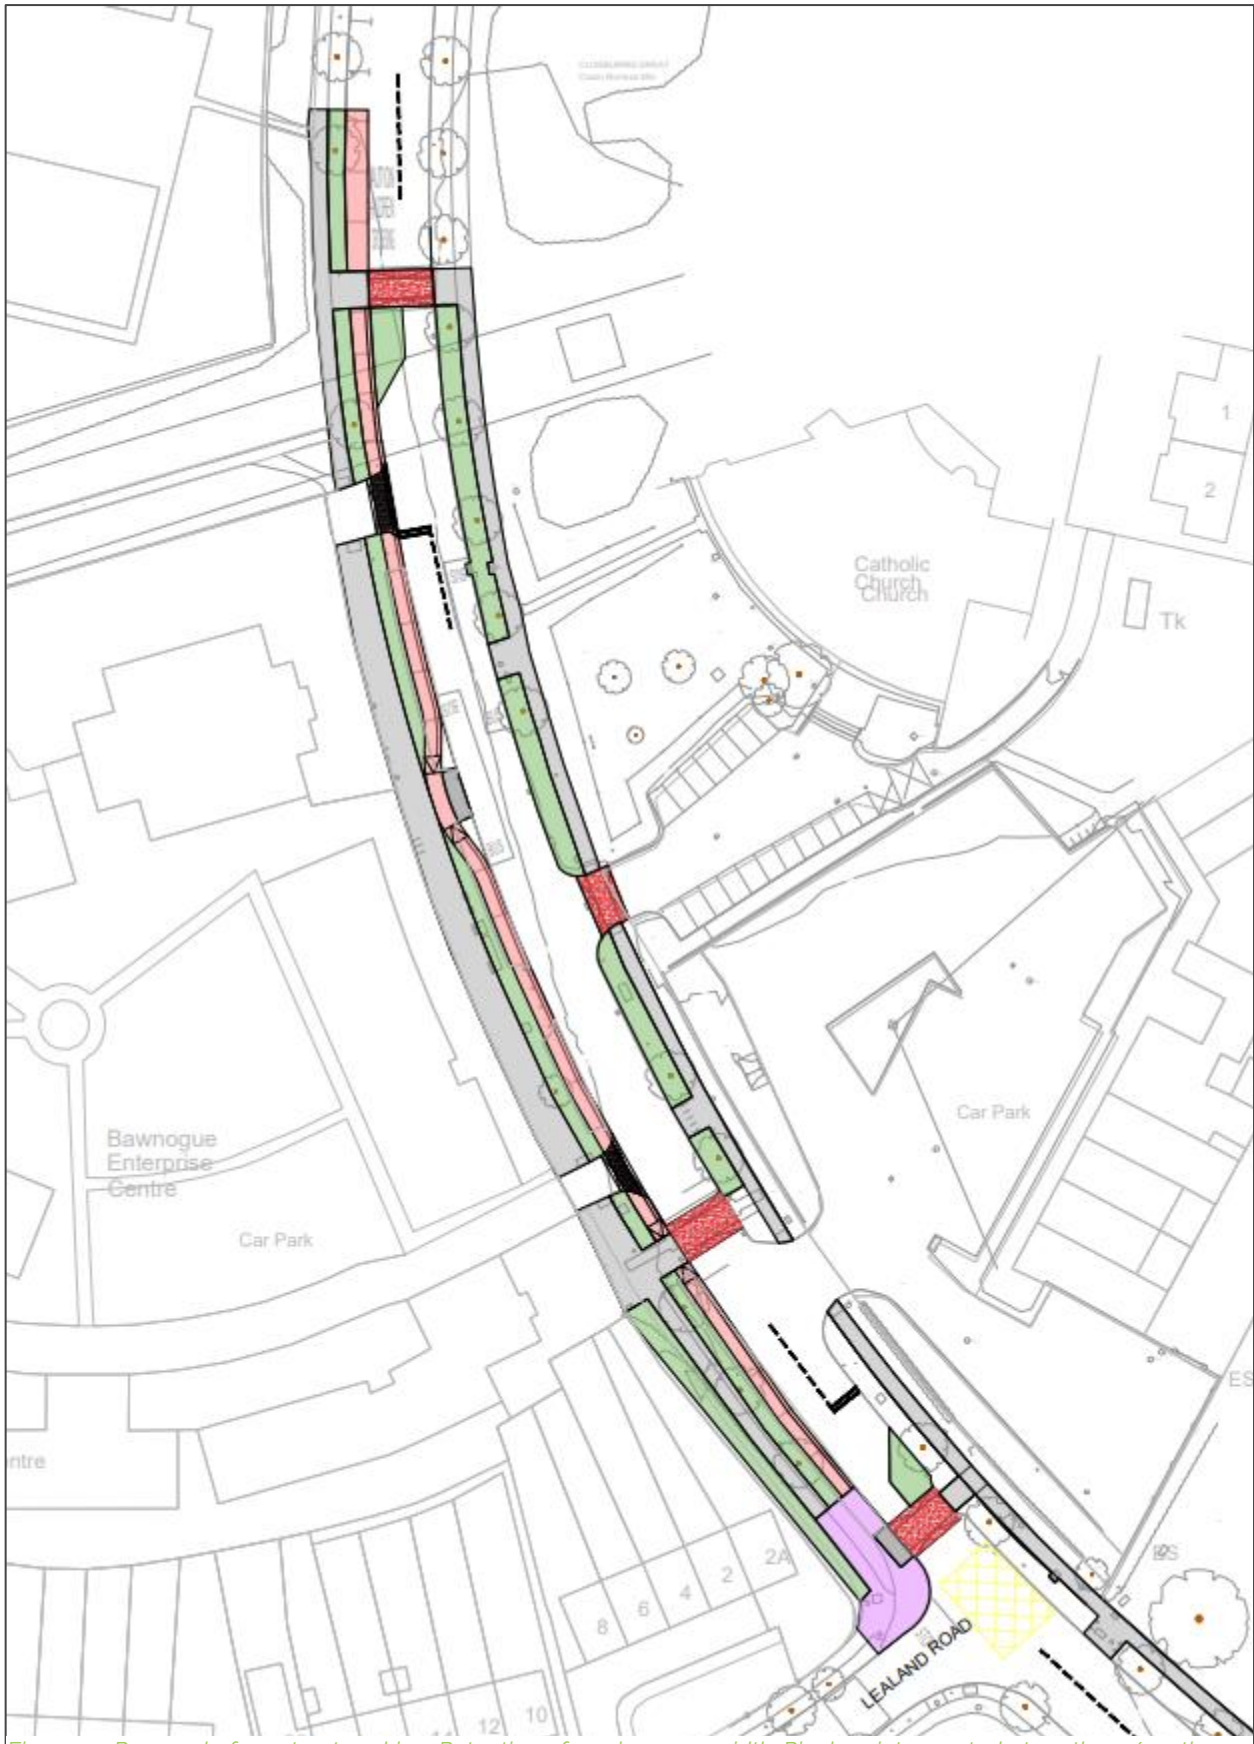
Removal of on-street parking. Retention of carriageway width. Pinch points created at northern/southern extents of scheme to help calm traffic and provide shortened crossing distances for pedestrians.
